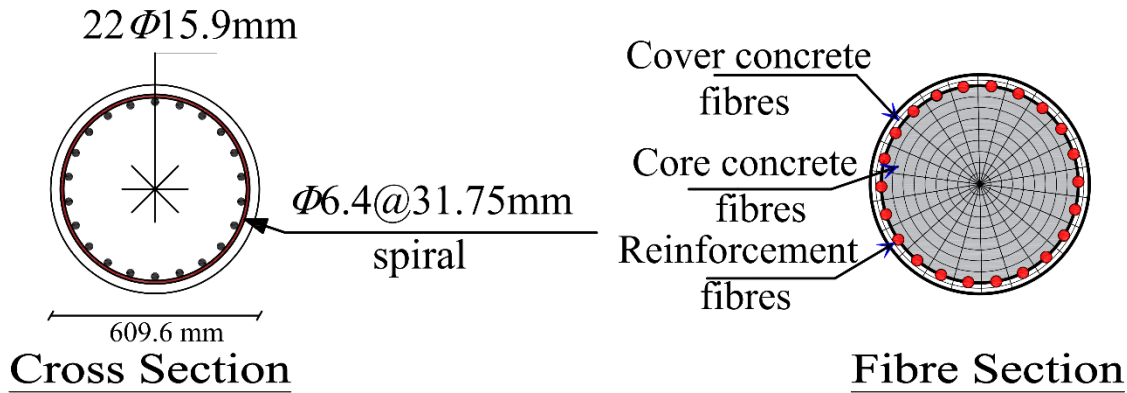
Cross-sectional details and fibre section of hypothetical circular RC column
